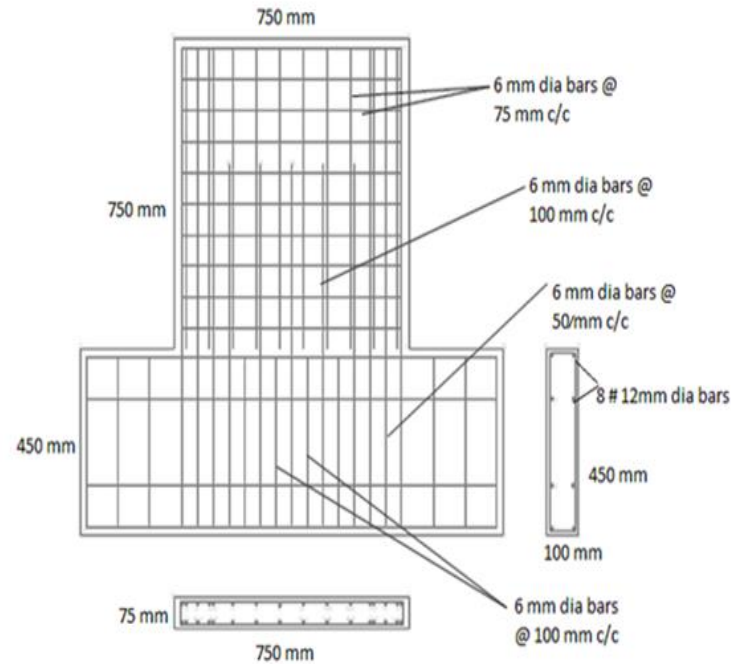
Dimensions and Reinforcement details of Shear wall specimens NM and UM
